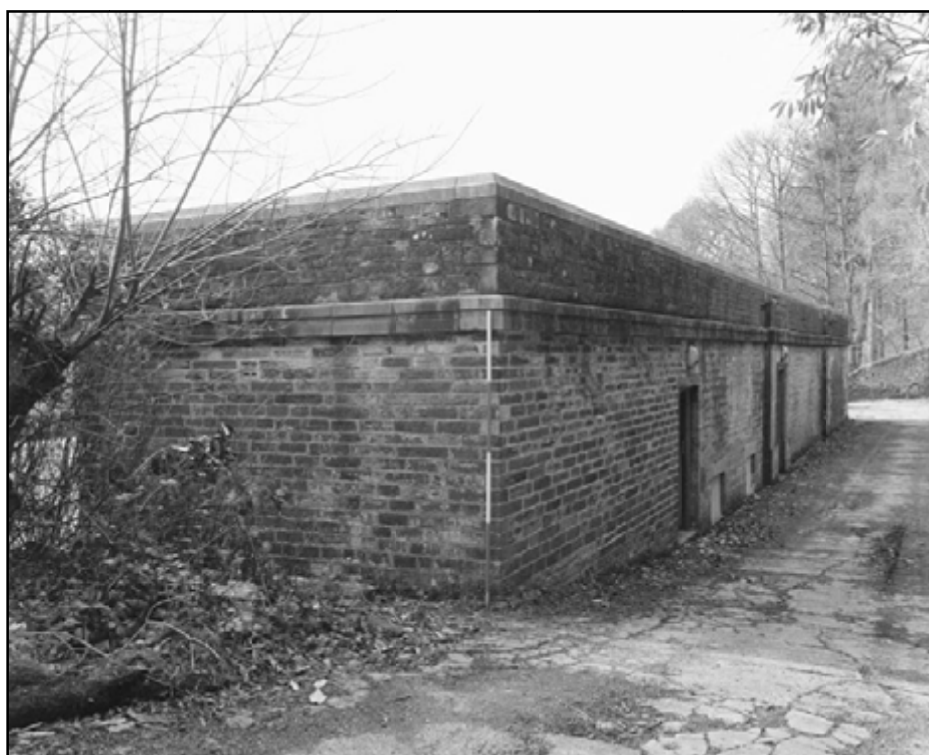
General view of north elevation and eastern elevation of extension (film 2.05)
